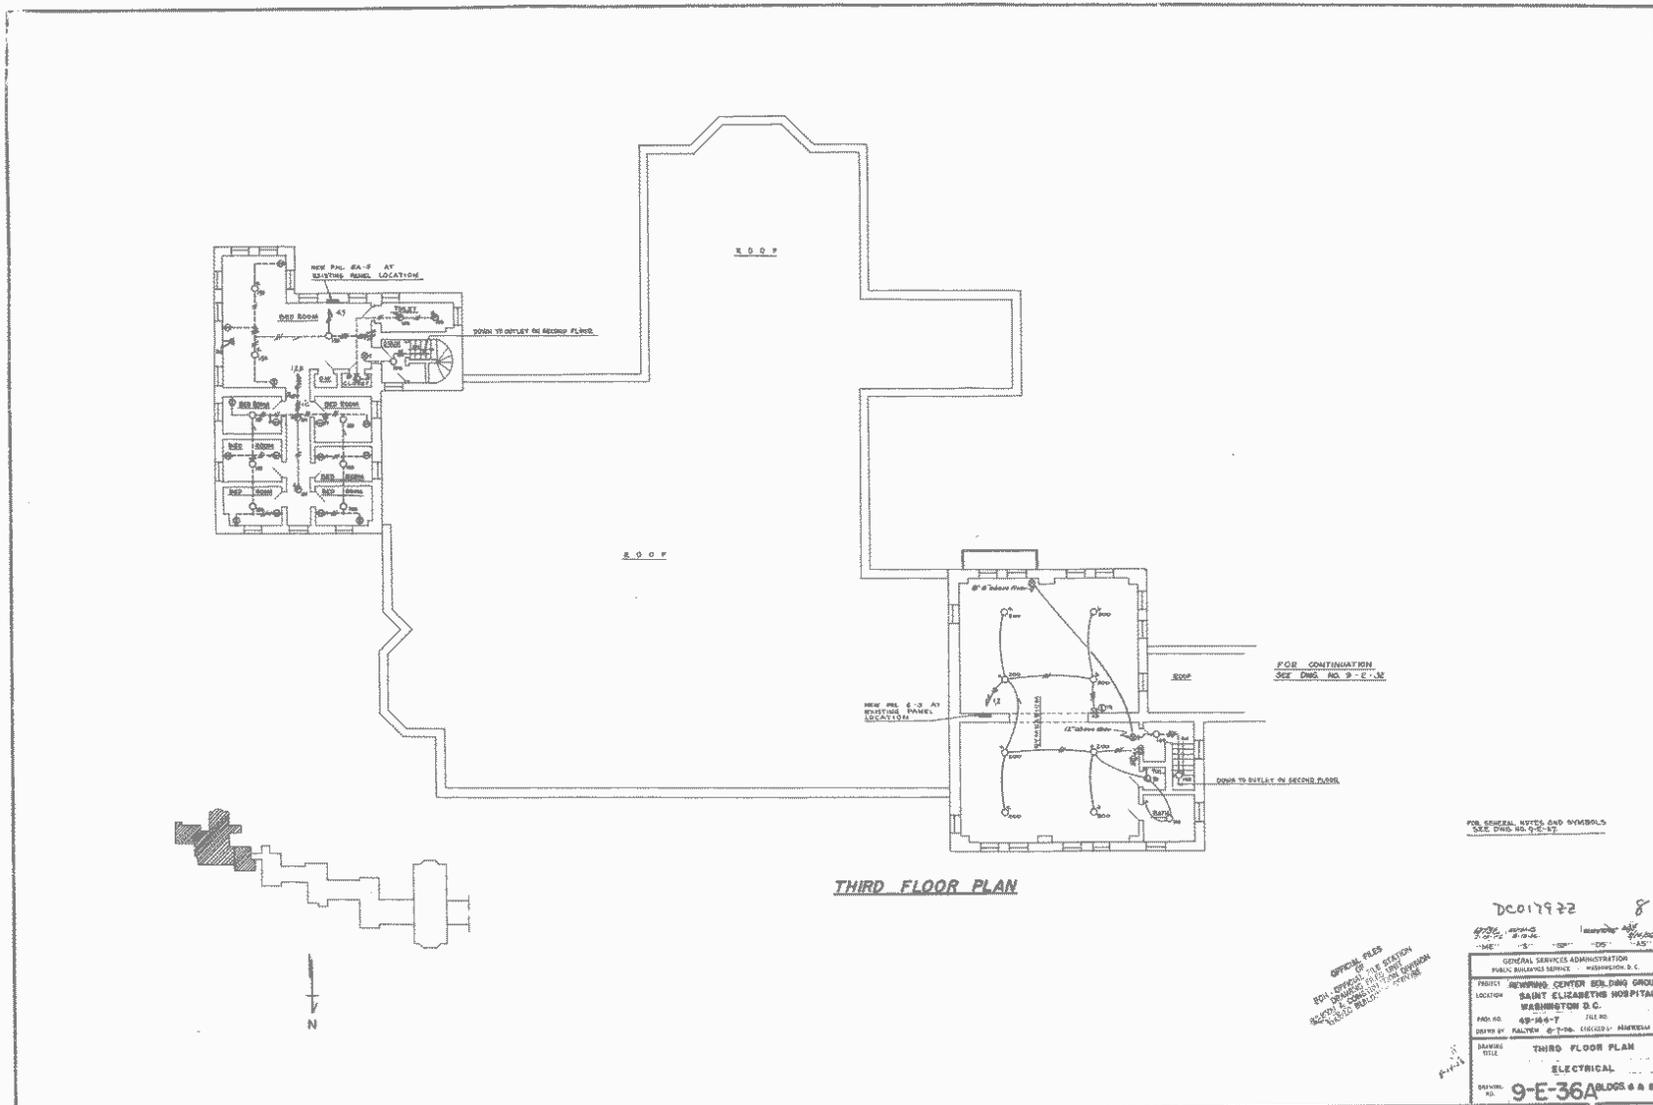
Third floor plan of Pine showing electrical improvements, 1956. Source: GSA Archives, image DC0179SE0008.
